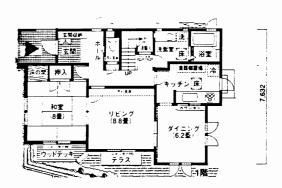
Plan without Open Unit Plan in Japan (Source: Tokyu Construction Ltd, 1997)
